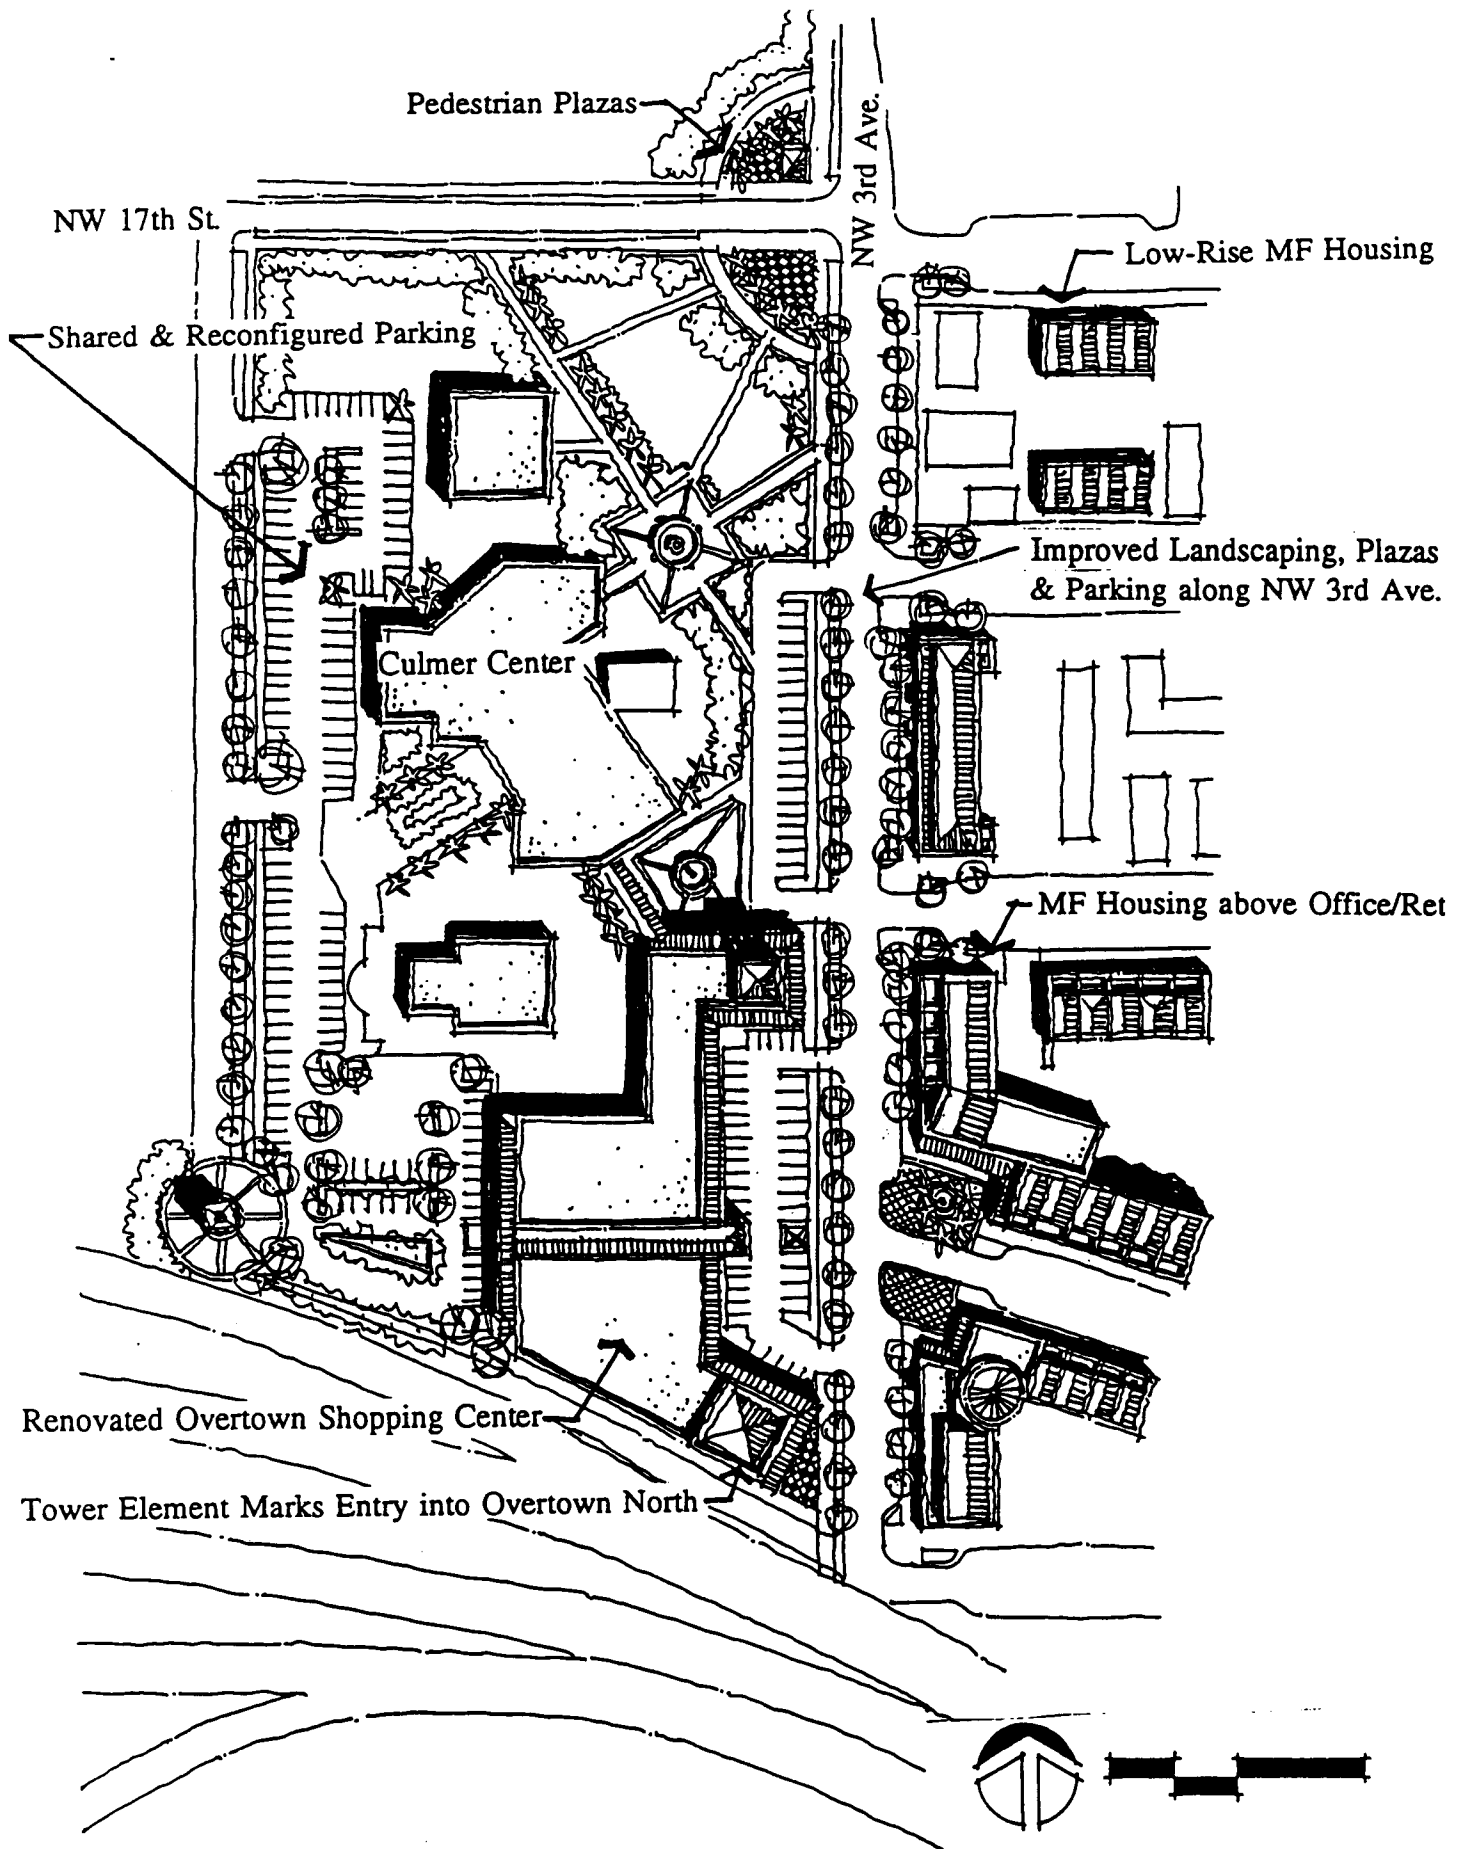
I: Illustrative Site Plan of Overtown Shopping Center and Culmer Center Area
